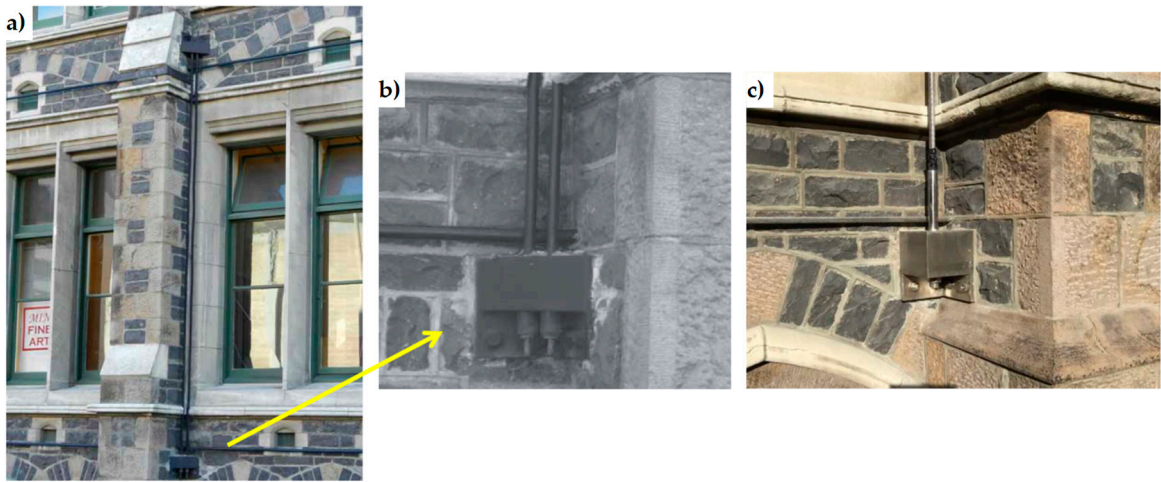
a) At the Christchurch Arts Centre, Chemistry building, the external vertical cables are connected to the structure through junction boxes, enhancing the compression caused by gravity loads to ensure that the wall stays in overall compression during shaking; b) Retrofit dating back to 1984, with pairs of external unbonded tendons; c) Post-earthquake retrofit, with a stainless steel cable.
